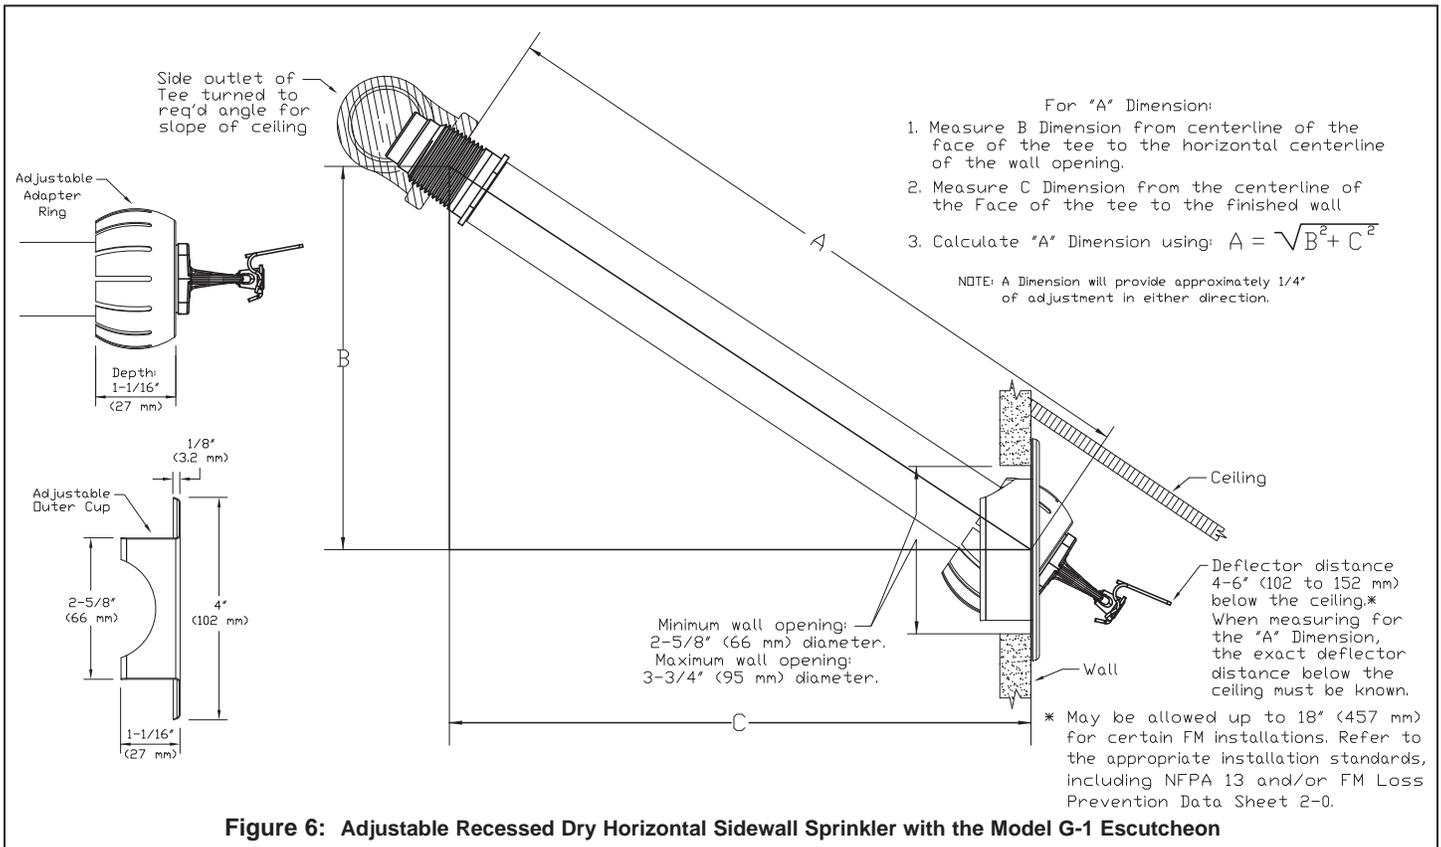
Adjustable Recessed Dry Horizontal Sidewall Sprinkler with the Model G-1 Escutcheon
